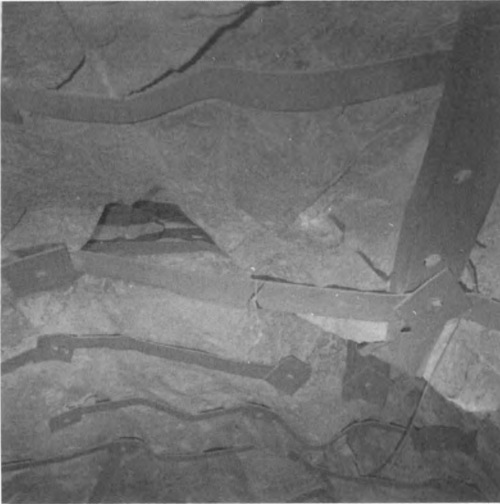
The integral head shell bolt, with both the flat strap requiring 0.9m bolt spacing, and the more flexible W-strap.
